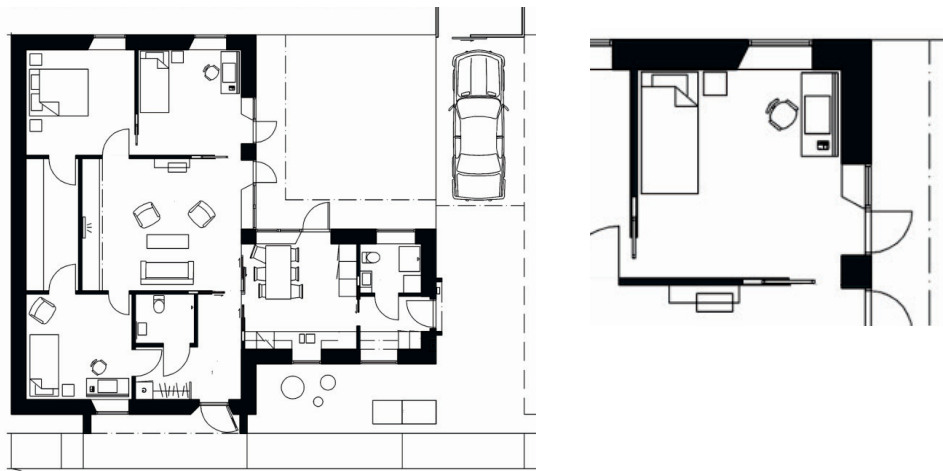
FIGURE b. with inset. Pumpkälleghagen floor plan. The room with windows facing two directions and a glazed door onto the protected outdoor space (drawings by Karlsson and Nylander Architects).
